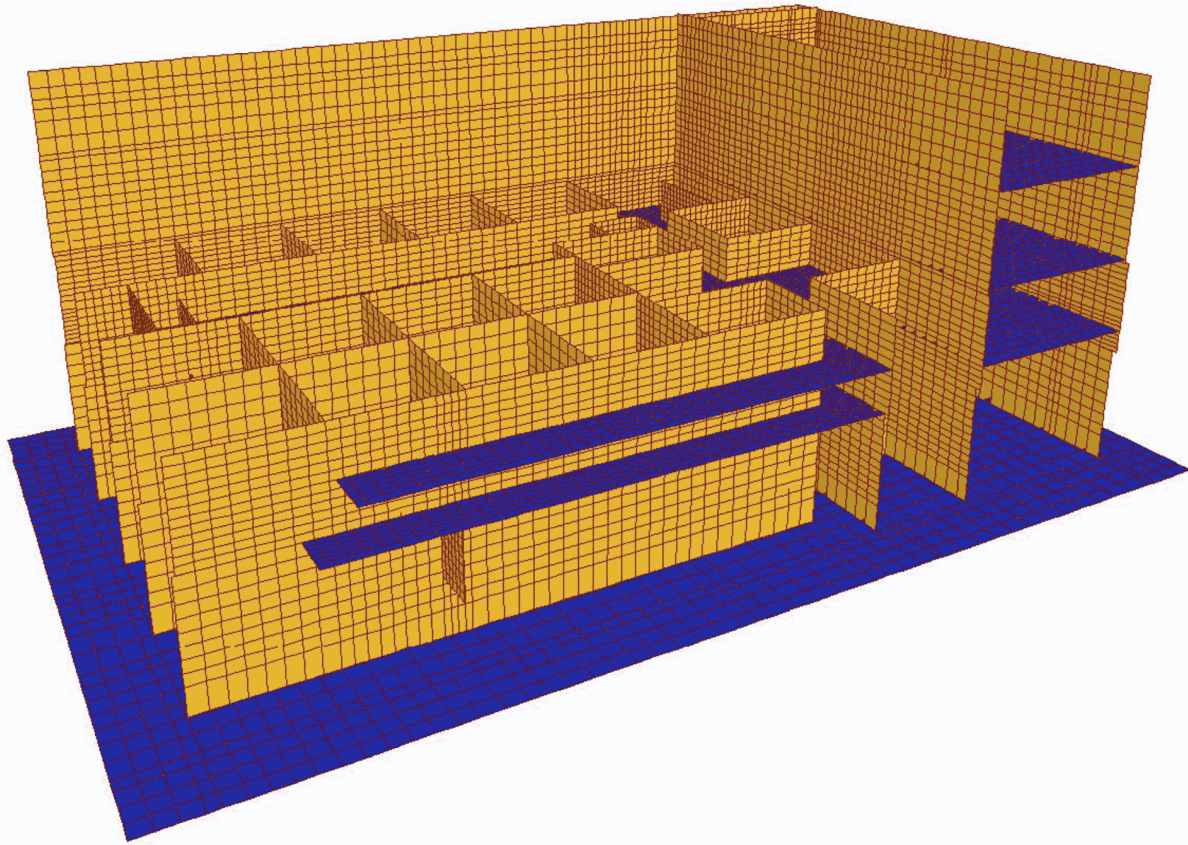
H.3-7 Radwaste Building SAP2000 Model (South Wall, West Wall, Roof and El. 35'-0" Slab Removed)
